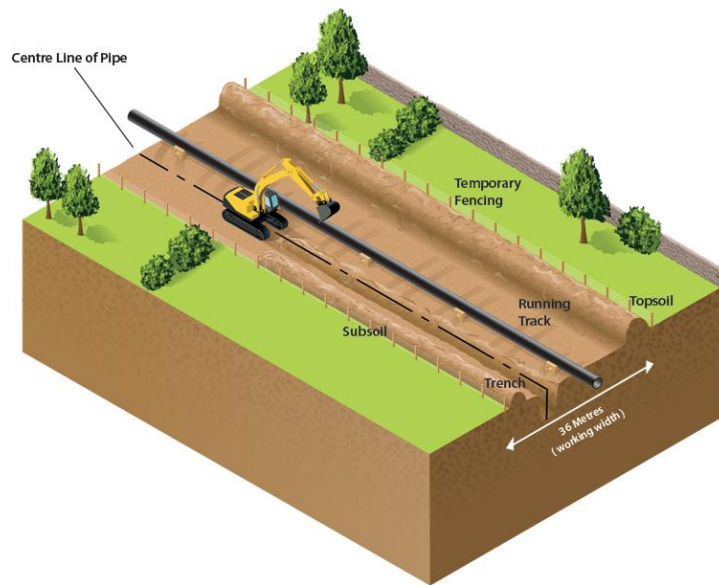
Illustration of a Trench Being Excavated for a Gas Pipeline
